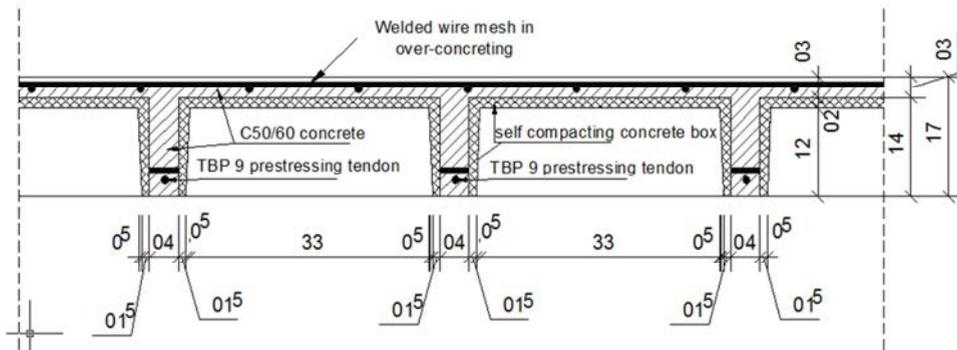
Transversal section, dimensions of the elements that compose the waffle slab.
